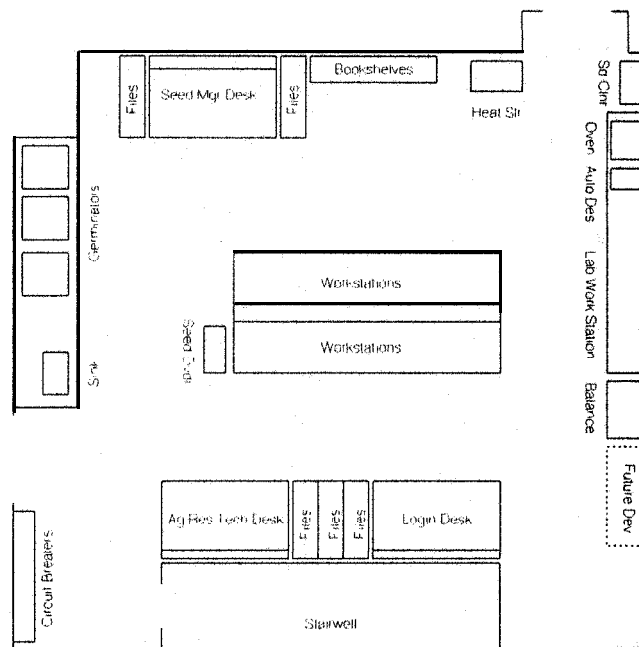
Proposed floor plan for the Seed Storage laboratory.
